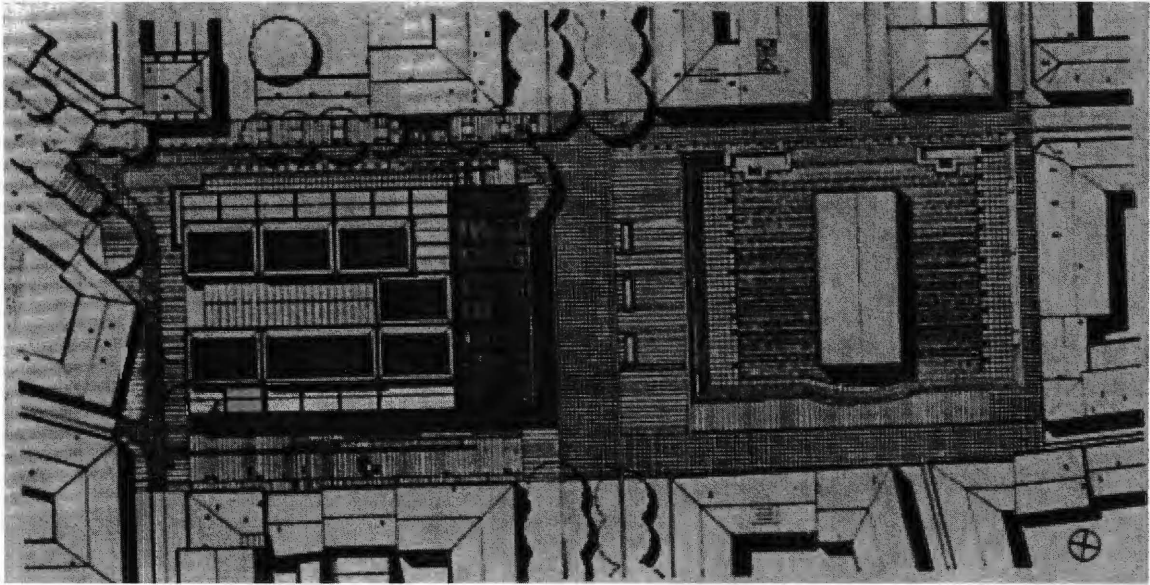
, *CARREE D'ART, SITE PLAN (MORRIS)
